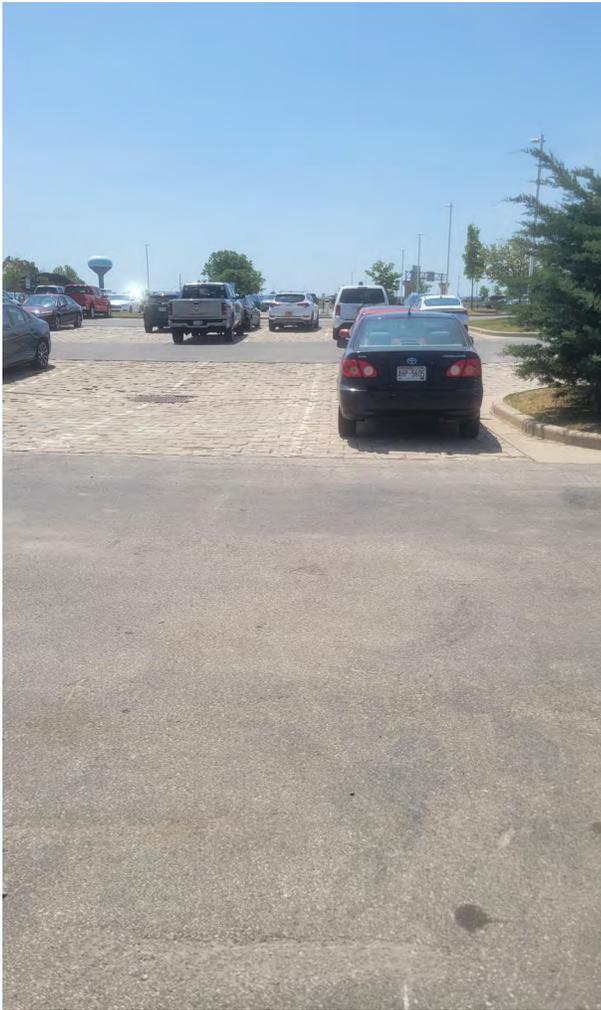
Asphalt paved parking lot of Lot 3 (east of ABB building). Permeable pavers along parking rows of ABB parking lot. View to south; photograph taken on June 1, 2023.
